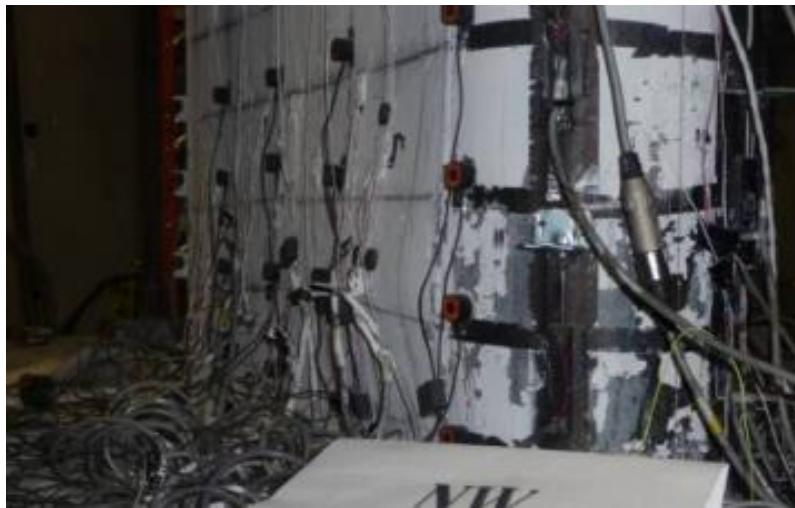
First Wave of Local Buckling Specimen, North West Side, CFSSP-NB2 at 1.8% Drift
